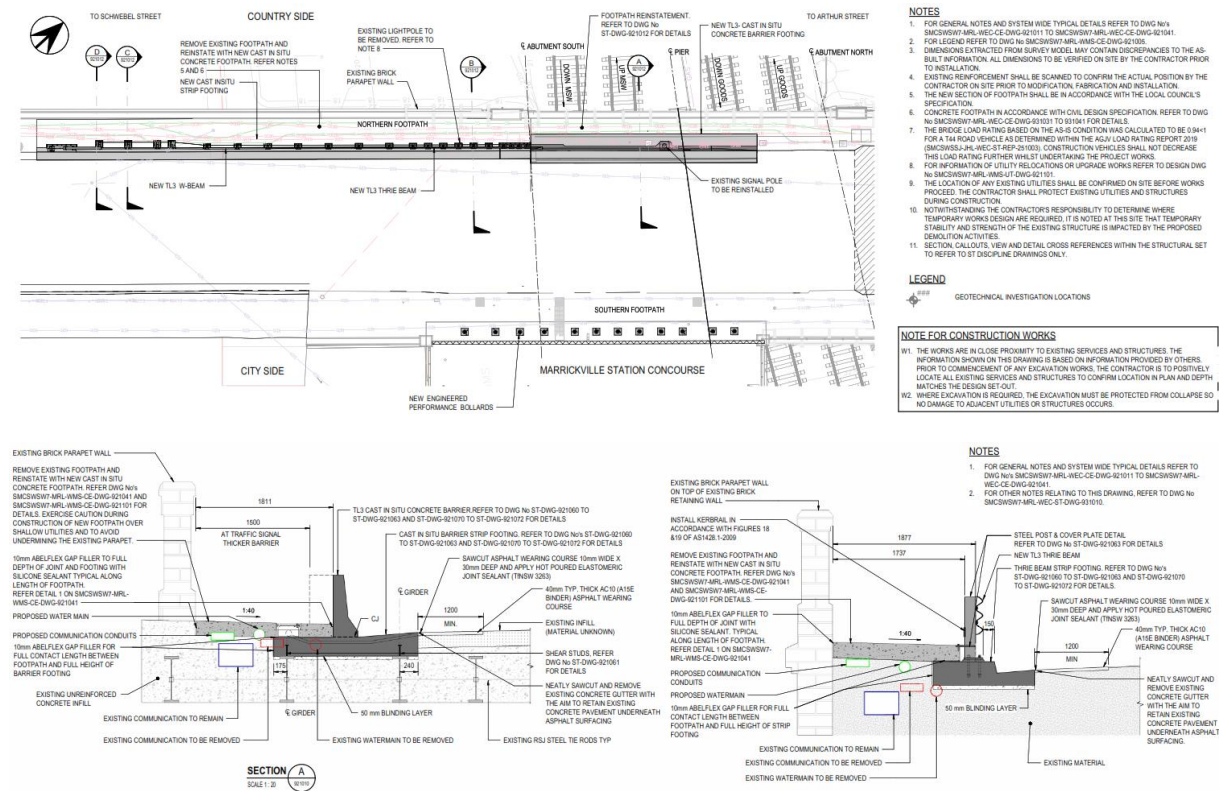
Plan of treatment works for Illawarra Street Bridge (Source: Aurecon 2024, provided by ARCH Artifex)
